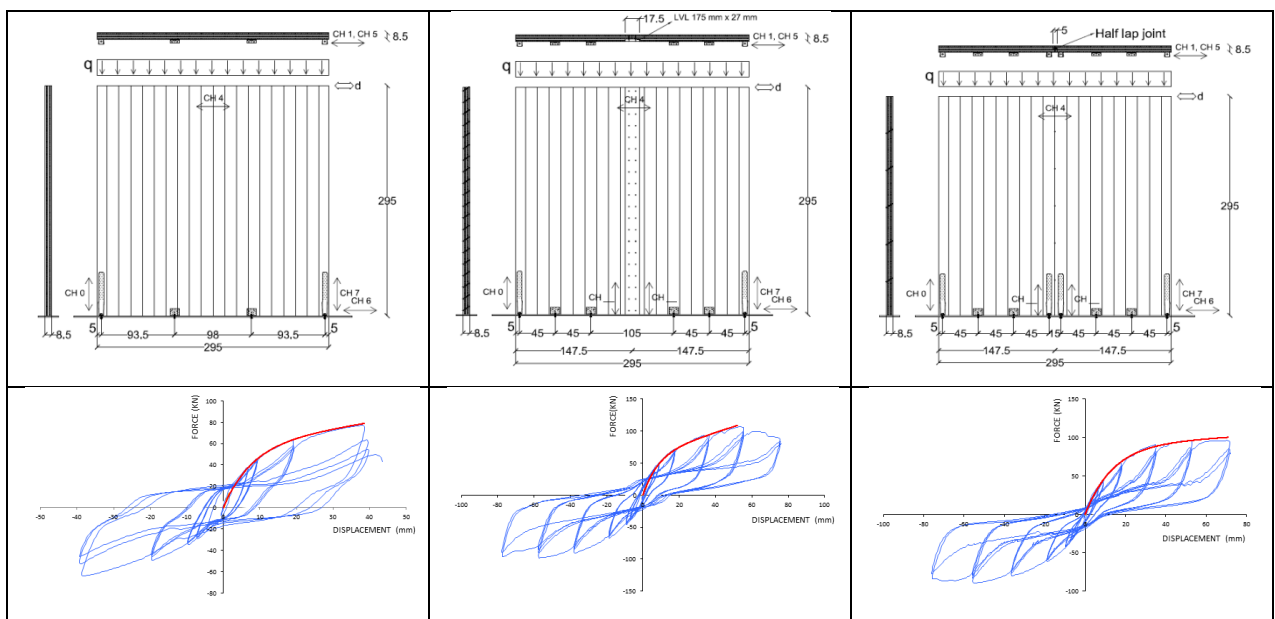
Fasteners configuration and load slip curve of the tested walls
